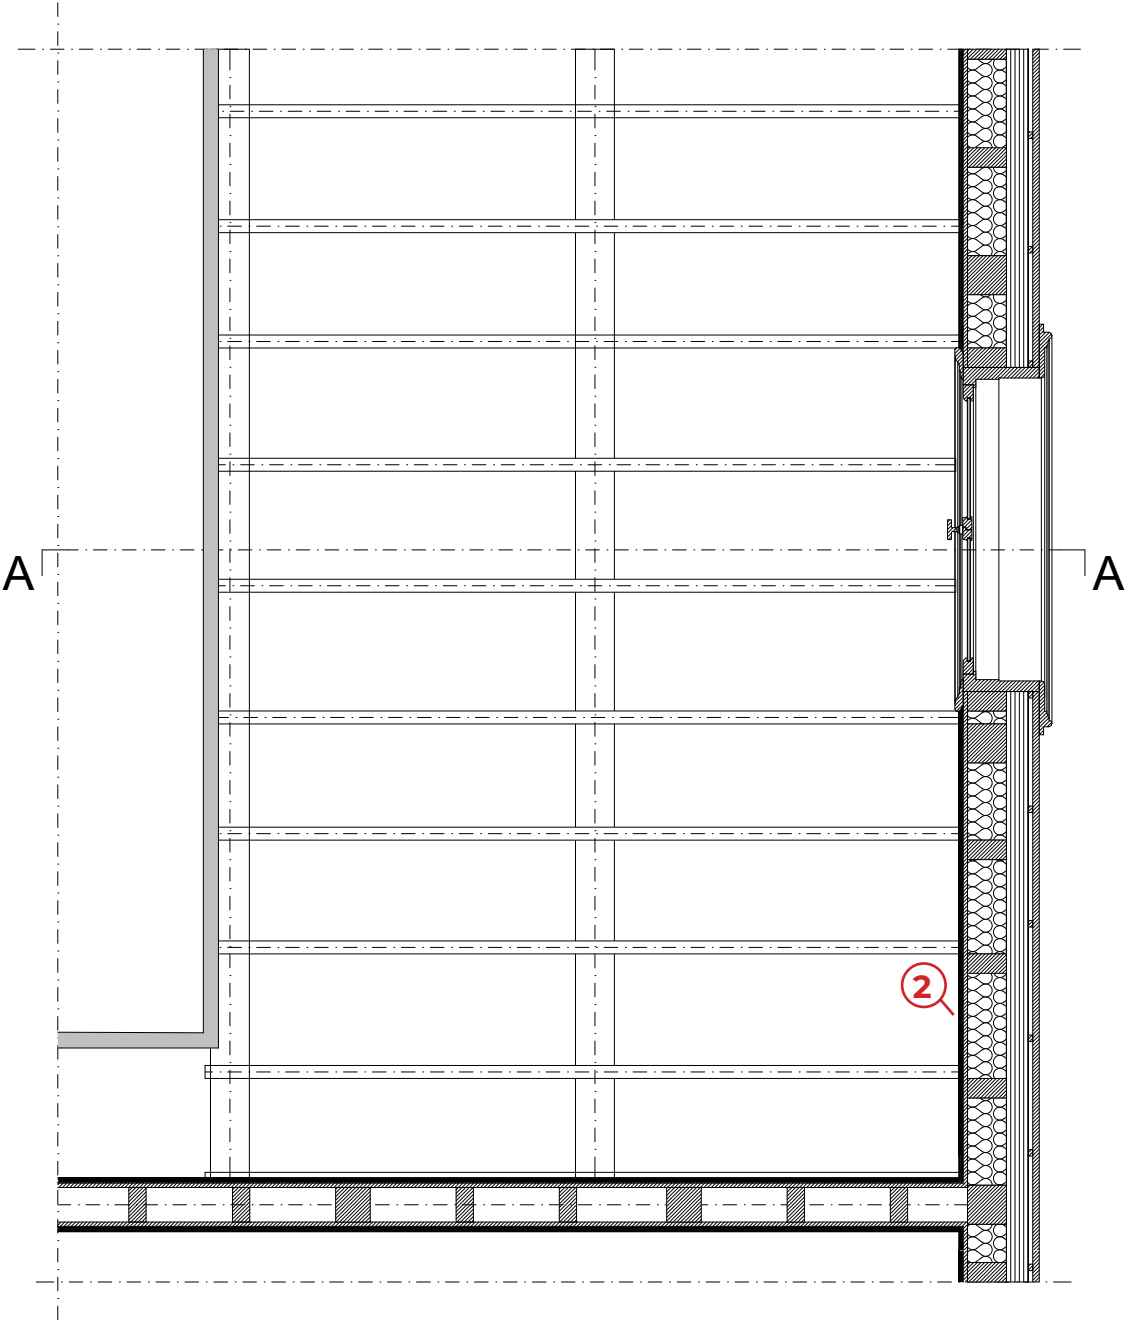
Consolidation Intervention Proposal First Floor Detail Plan (Source: Created by the author, 2025)
